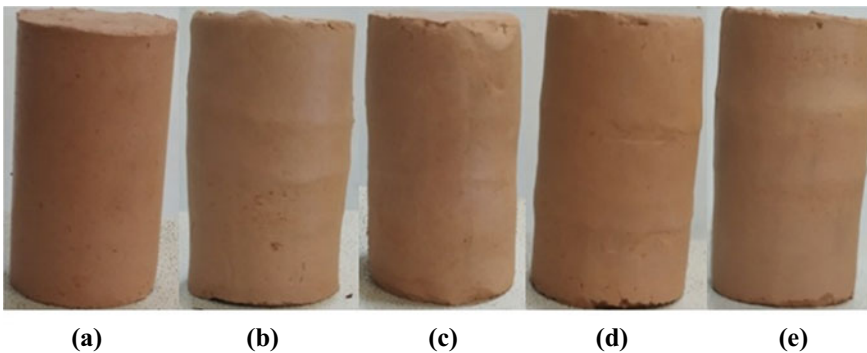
Soil specimen before and after loading with and without geotextile a Plane soil specimen before loading b Plane soil specimen after loading c Soil specimen with one-layer geotextile after loading d Soil specimen with two-layer geotextile after loading e Soil specimen with three-layer geotextile after loading
